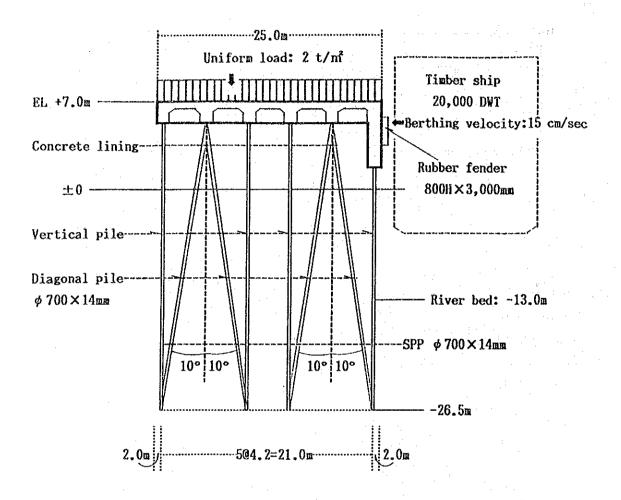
Proposed Typical Cross-Section of Wharf
